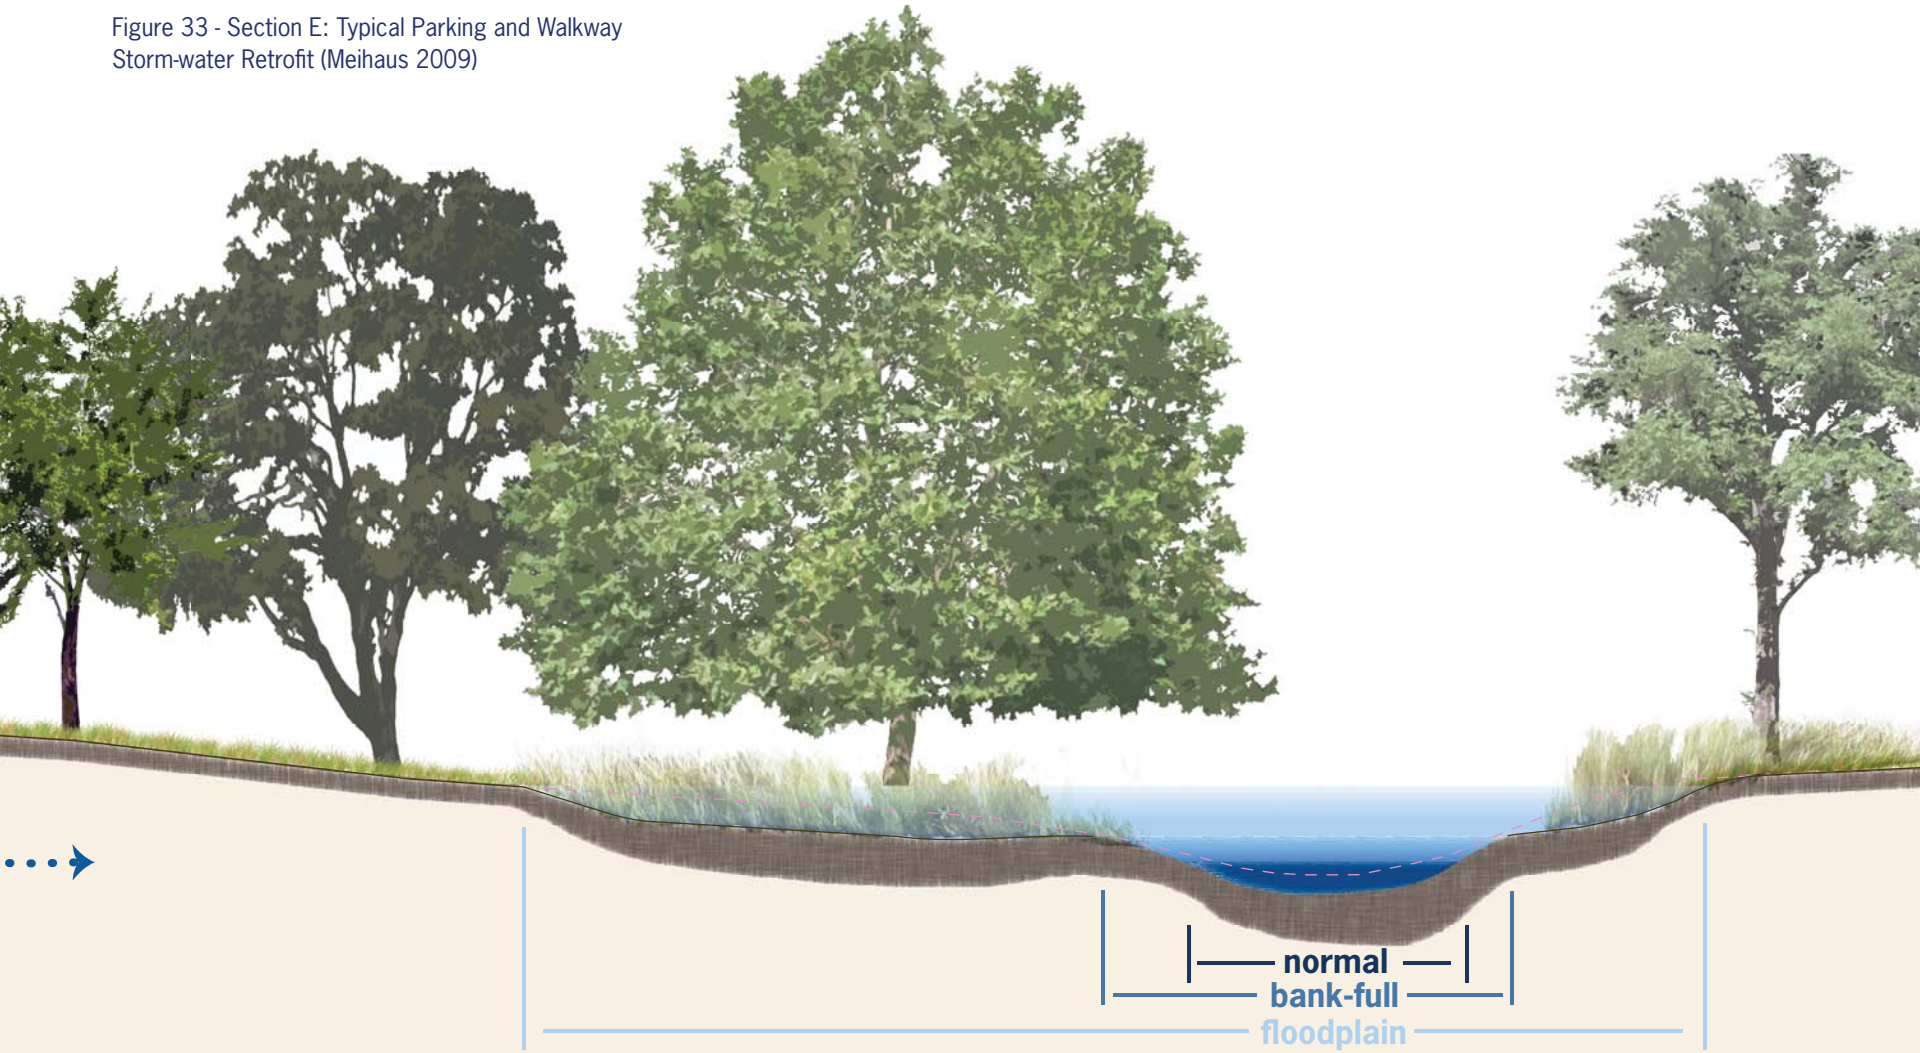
Section E: Typical Parking and Walkway Storm-water Retrofit (Meihaus 2009)
